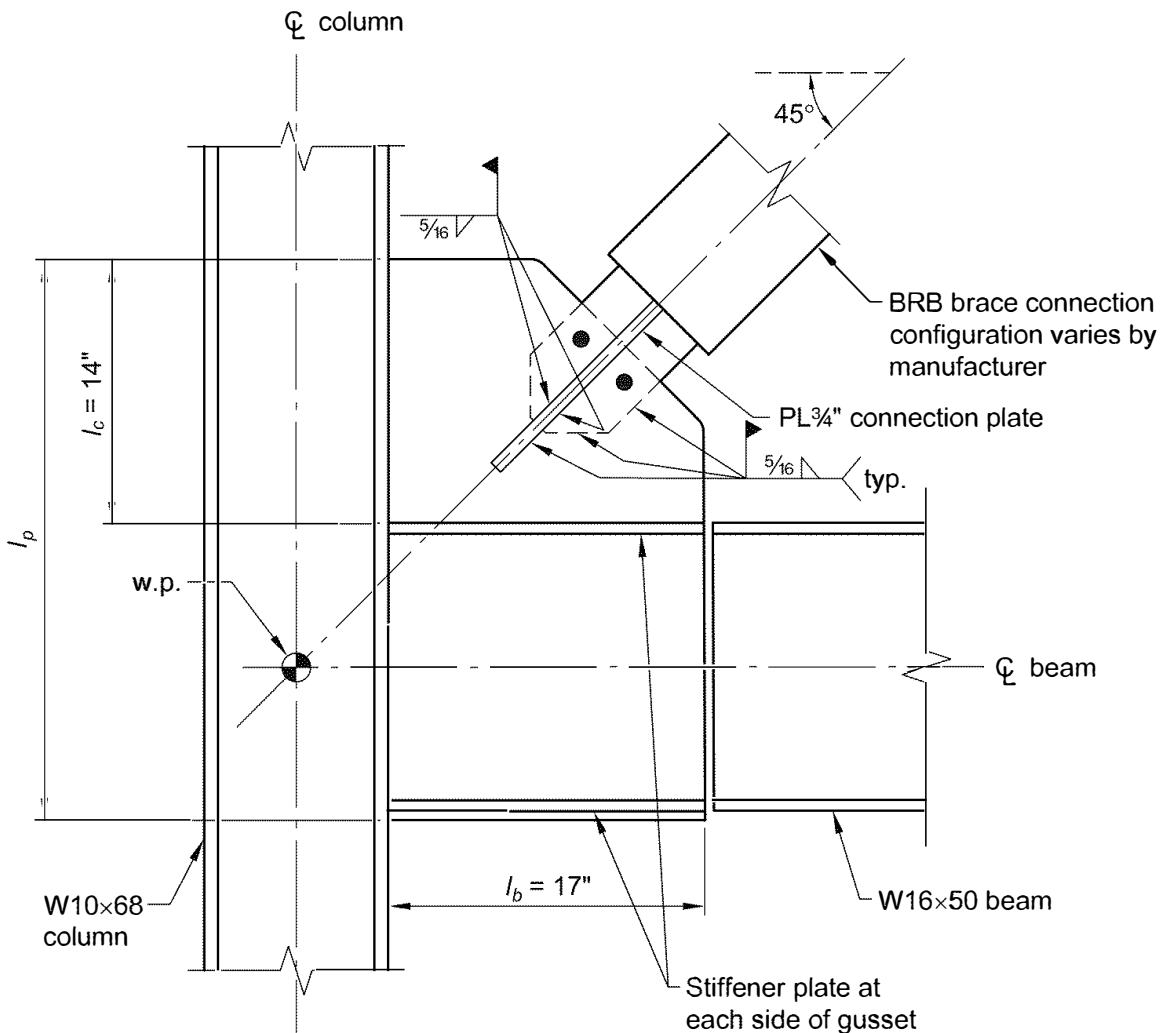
BRB brace to beam/column connection geometry for Example 5.5.4.
